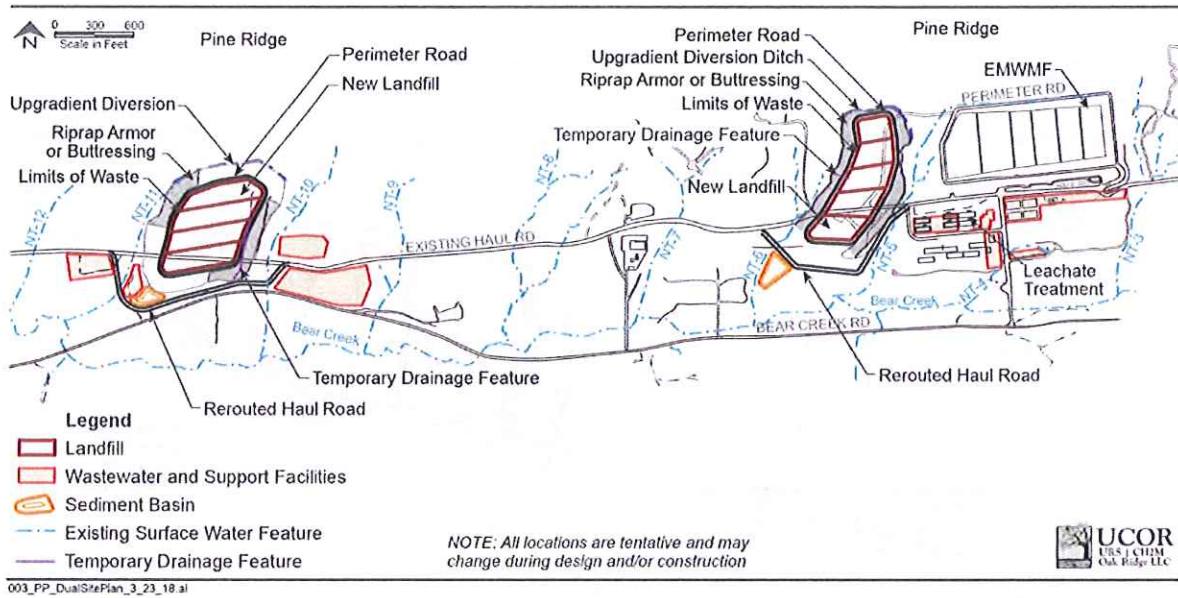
Dual Site Bear Creek Valley EMDF site plan.
